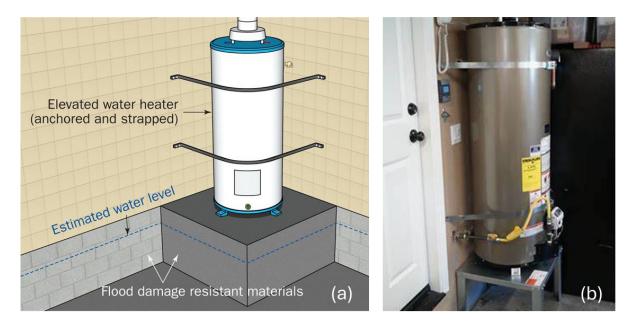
Water Heaters Elevated (a) on a Pedestal and (b) on a Platform with Bracing Straps Securing it to the Wall
